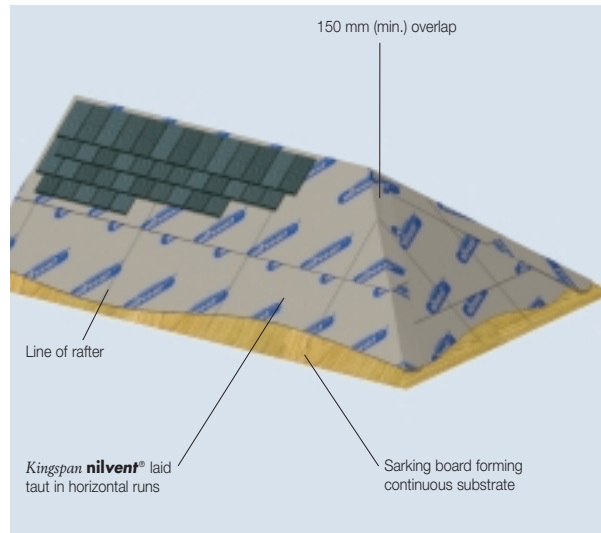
Hips – Fully Supported Horizontal Installation with Natural Slates
